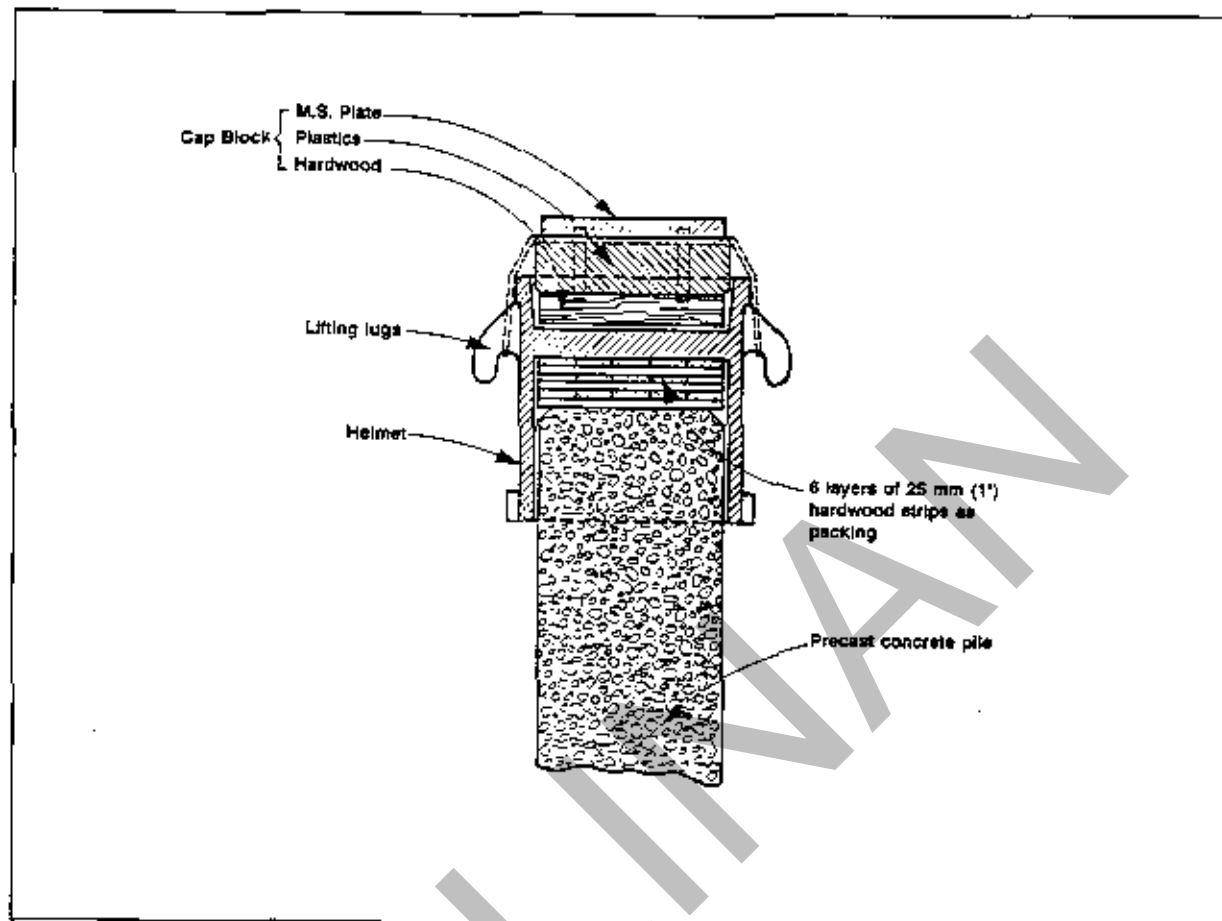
Typical Cap Block and Helmet for precast concrete pile
